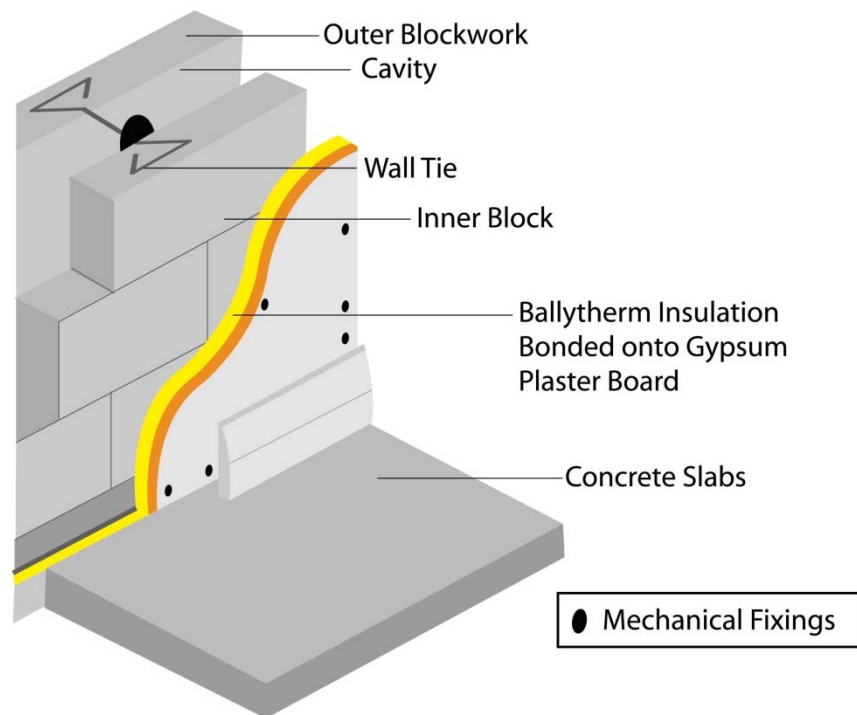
Internal insulation of masonry wall with plasterboard laminate
